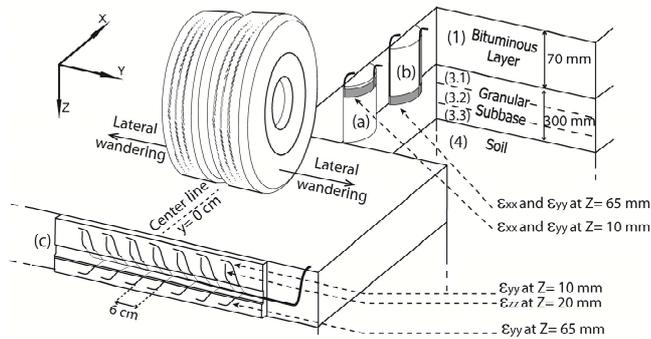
Configuration and instrumentation of the structure B (two instrumented concrete cores (a and b) and one instrumented polymeric plate (c))
